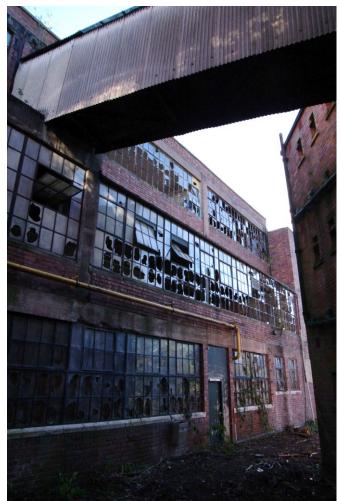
South-west facing elevation of Building F-L (north end) Looking east. 1m scale. Bridge leads to Building V on right
